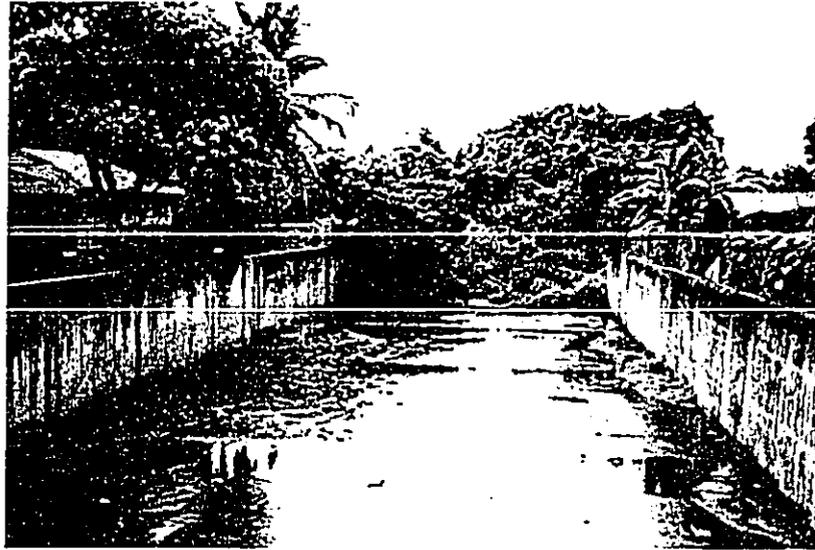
, Makai side of Waimanalo Stream Bridge, at Kalaniana'ole Highway with vegetation intruding into the stream bed downstream.
